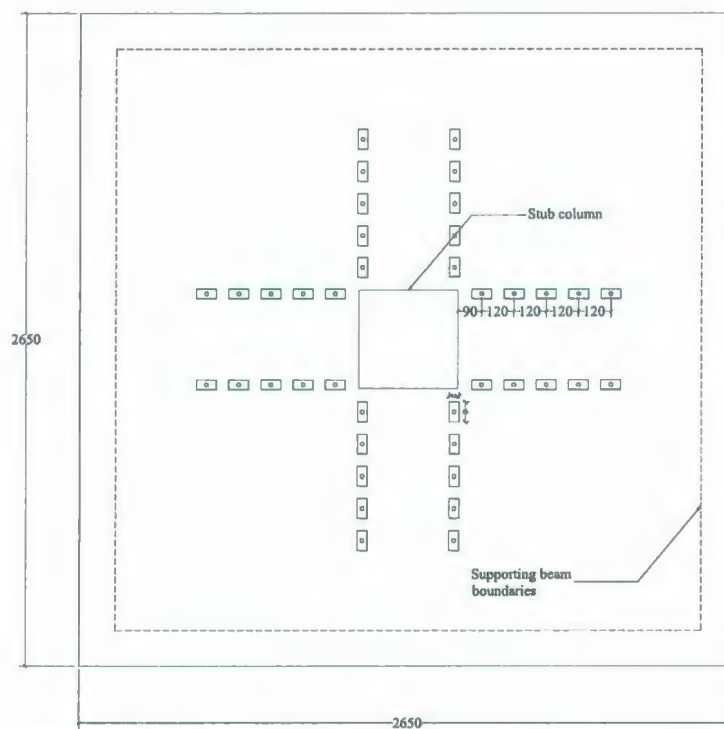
Arrangement of T-headed shear reinforcement in slab HS5 ( $h = 300$  mm)
